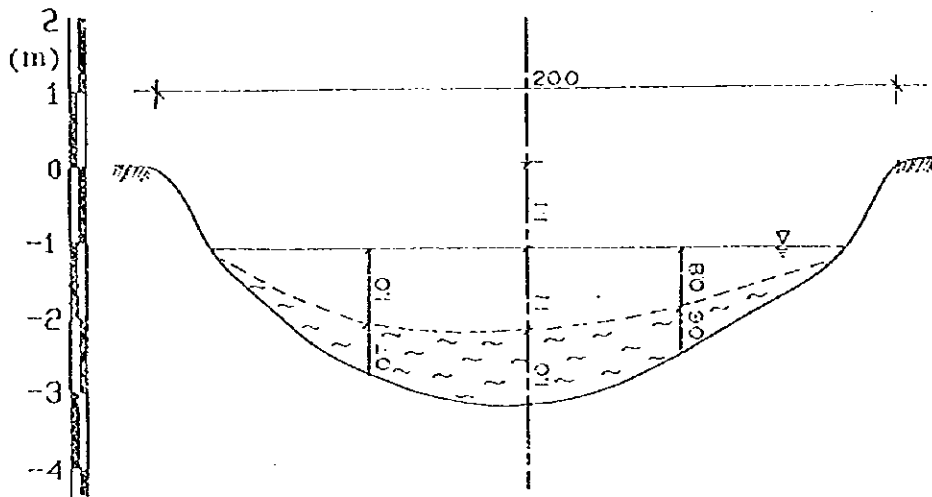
Diagrammatic Cross-Section of Channel (River) in Airport Construction Site
